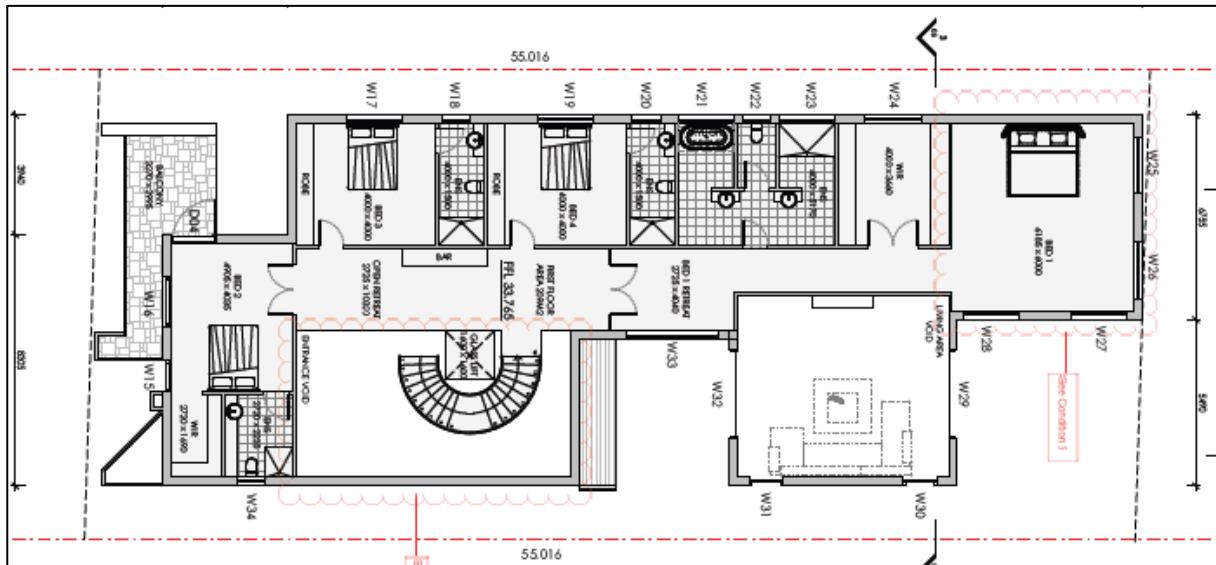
Approved First Floor Level (note: Condition 6 imposed to relocate Bedroom 1 to the void area and reduce the void around the stairs)
